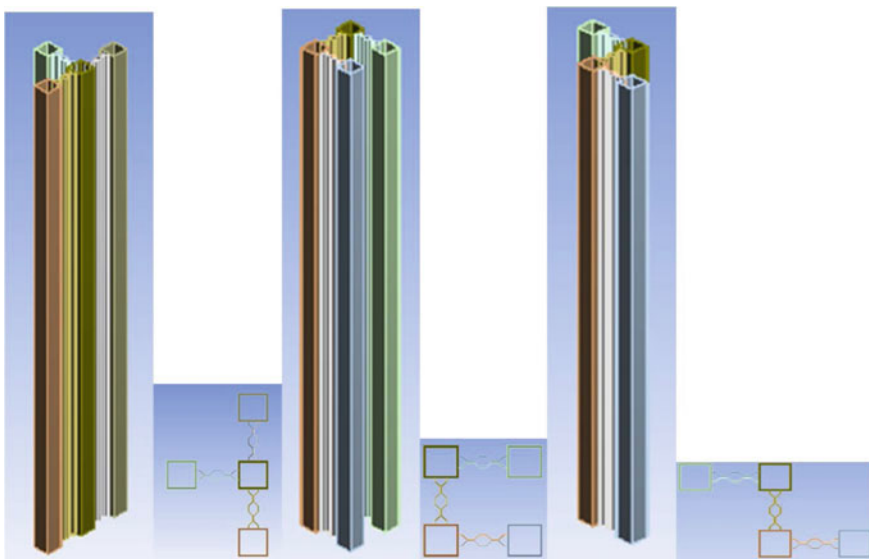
Geometry of T-shape, C-shape, Z-shape hollow steel tube columns
